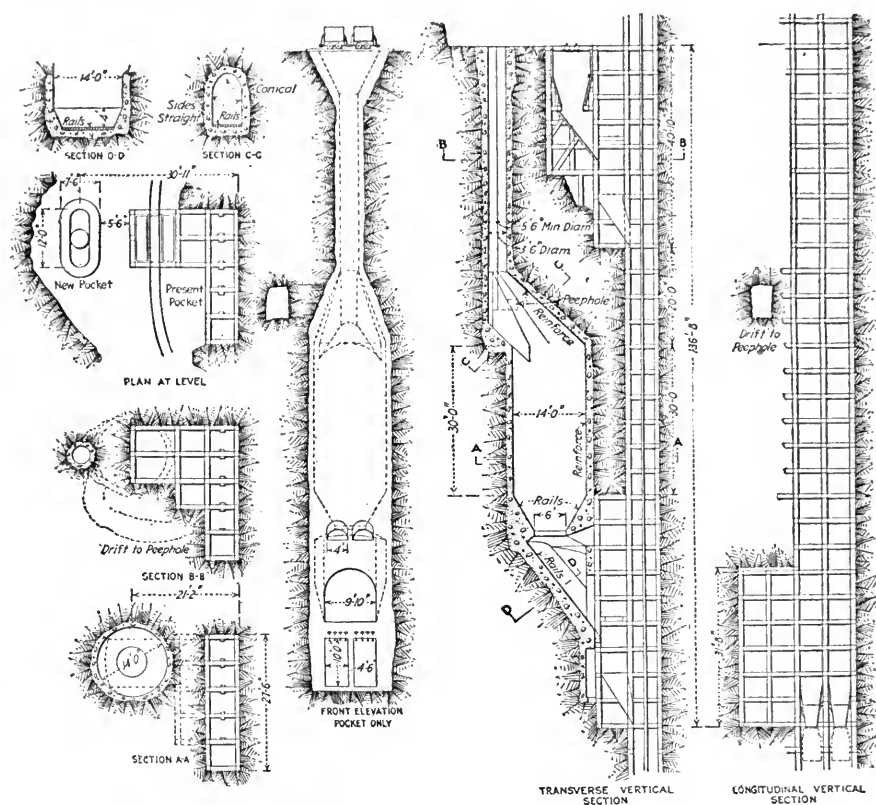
SECTION OF NEW CONCRETE-LINED SKIP POCKET AND OLD TIMBERED POCKET.
